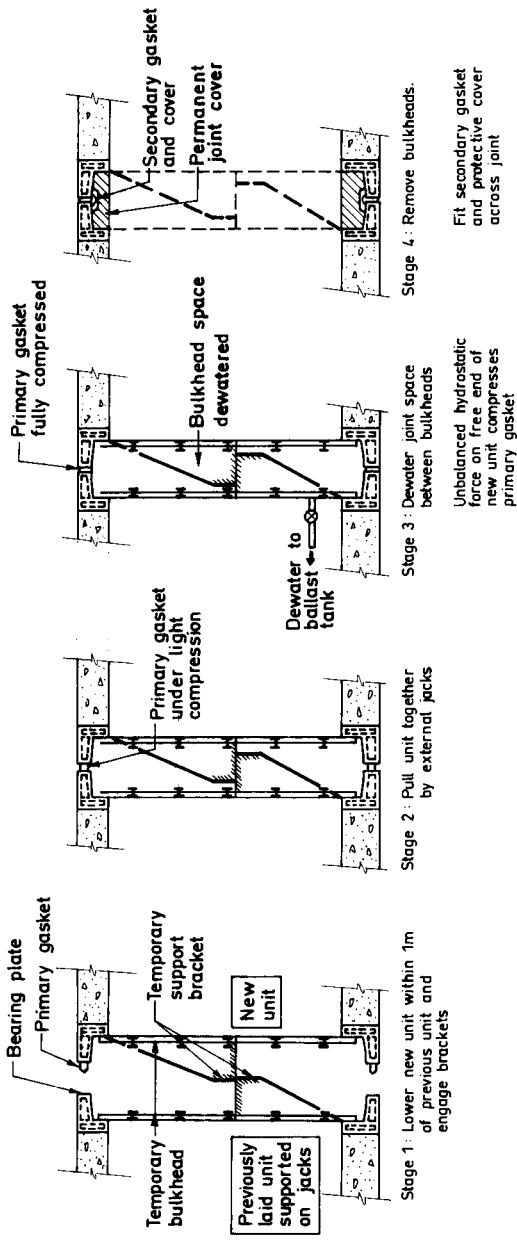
Hydrostatic joint in rectangular box section tunnel
